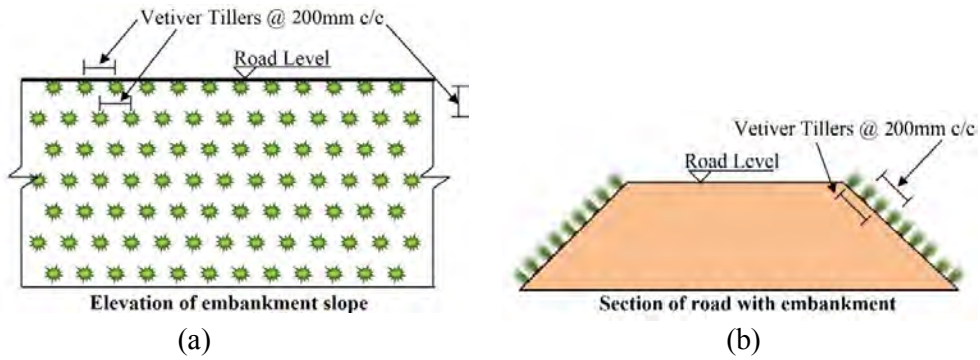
Vetiver plantation at river/haor/saline zone embankment slope: (a) elevation and (b) section
